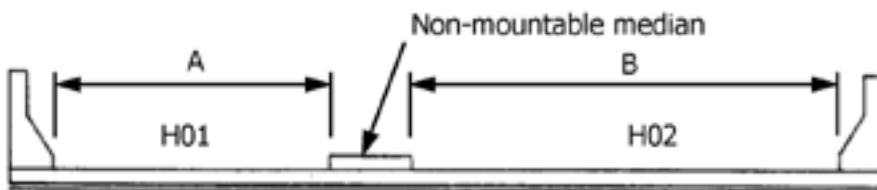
Cross-section view of two highway features carried on the bridge with a non-mountable median.
